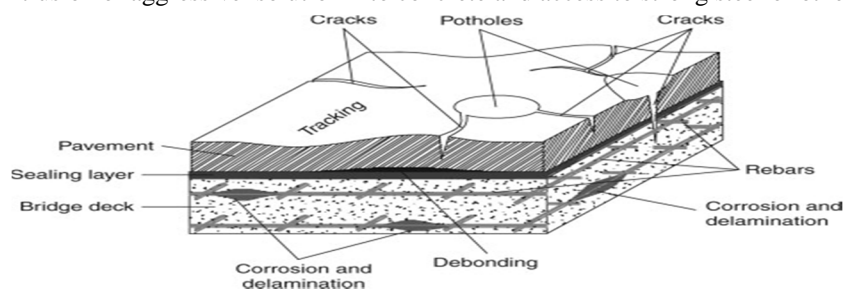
Common defects and deteriorations in concrete bridge deck
